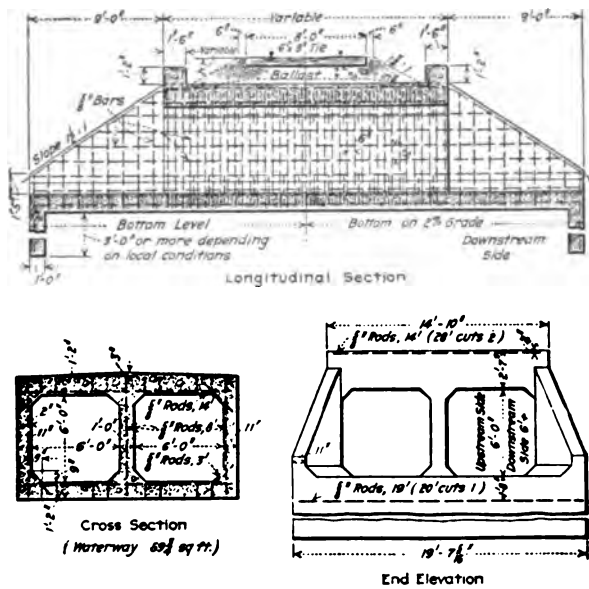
Double 6 X 6-ft. box culvert, A. T. & S. Fe. Ry. system.
